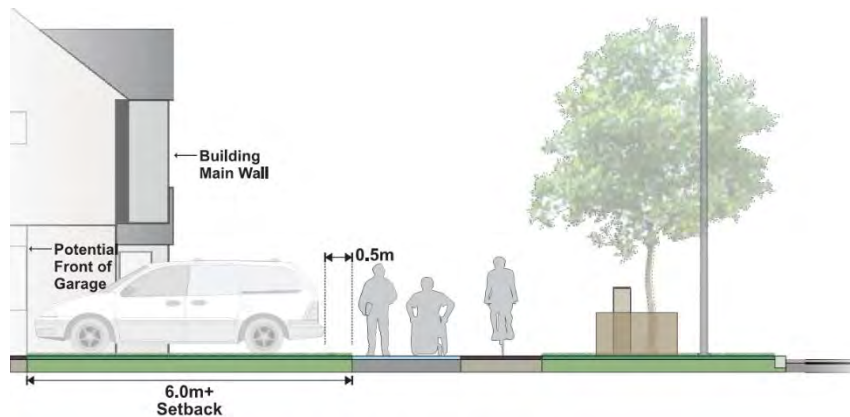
Driveway parking cannot be closer than 0.5m to sidewalks, cycle tracks, or curb
